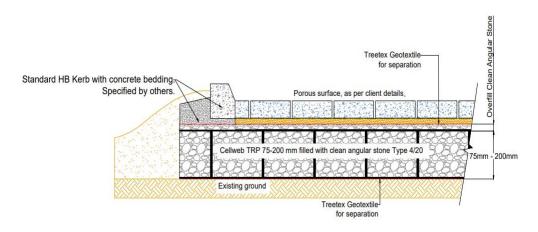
CellWeb path construction with concrete edging, Geosyn (2018).
